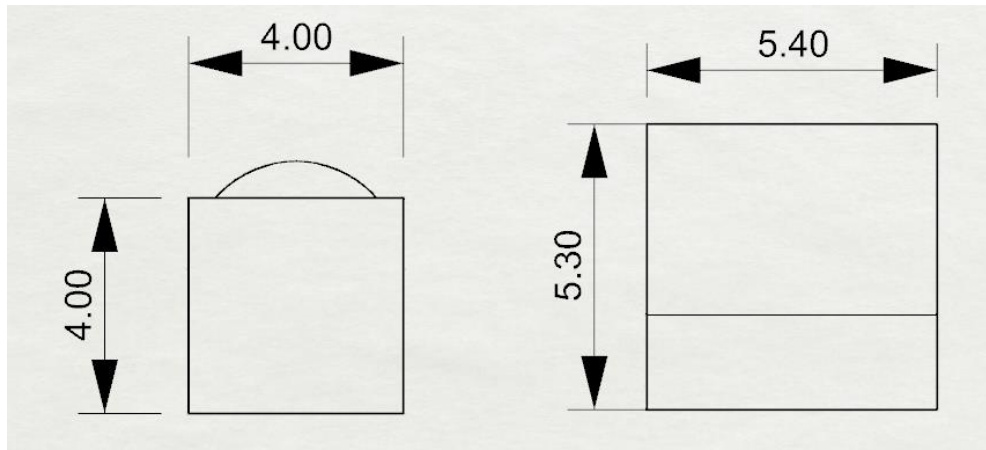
Front view of recoil tanks and LNGPac. (Dimensions in [m]).
